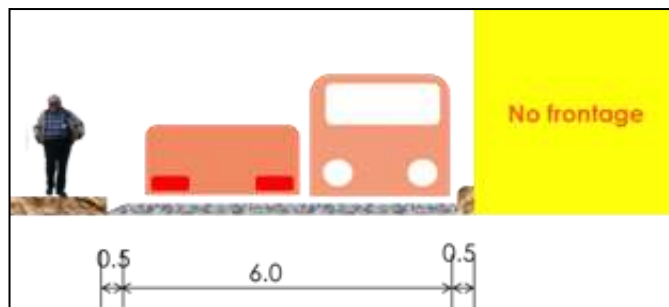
Typical Section of urban road "Class B" option 2
